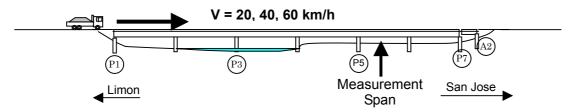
Image of Moving Load Test on No.27 Chirripo Bridge
